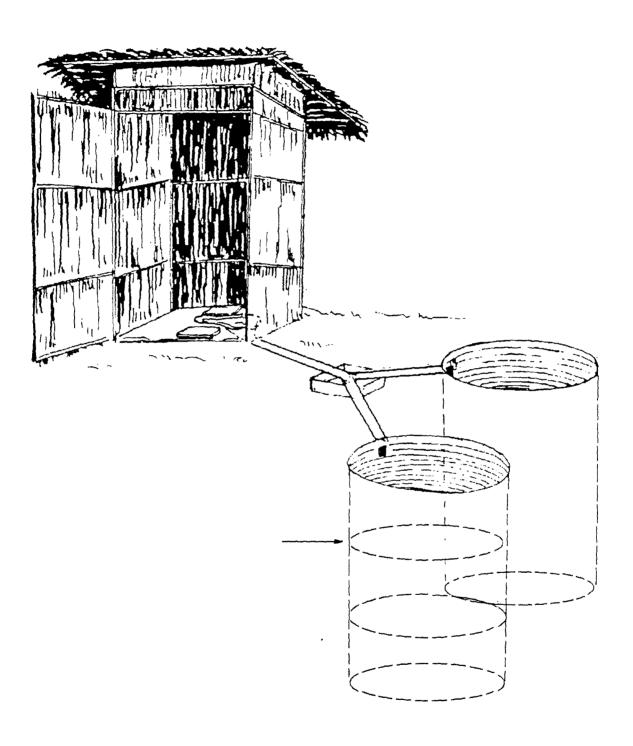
Twin pit offset latrine with a concrete ring pit lining system
